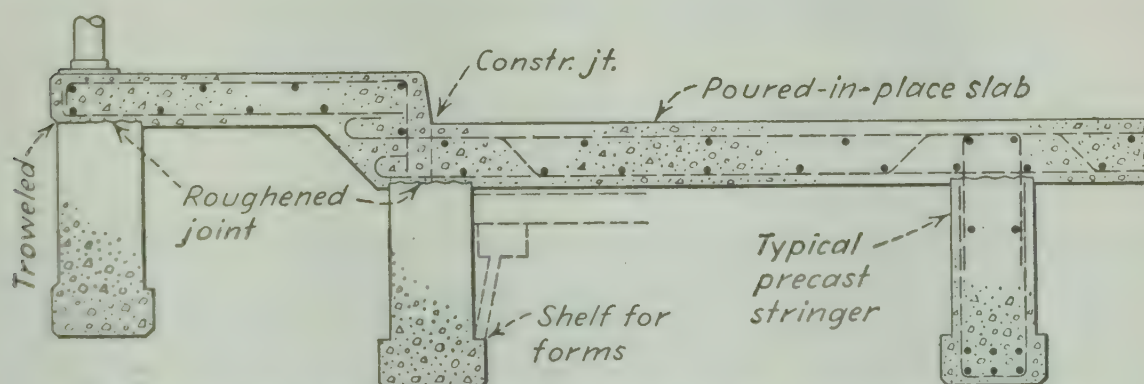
Girder bridge with precast stringers and poured-in-place deck.
